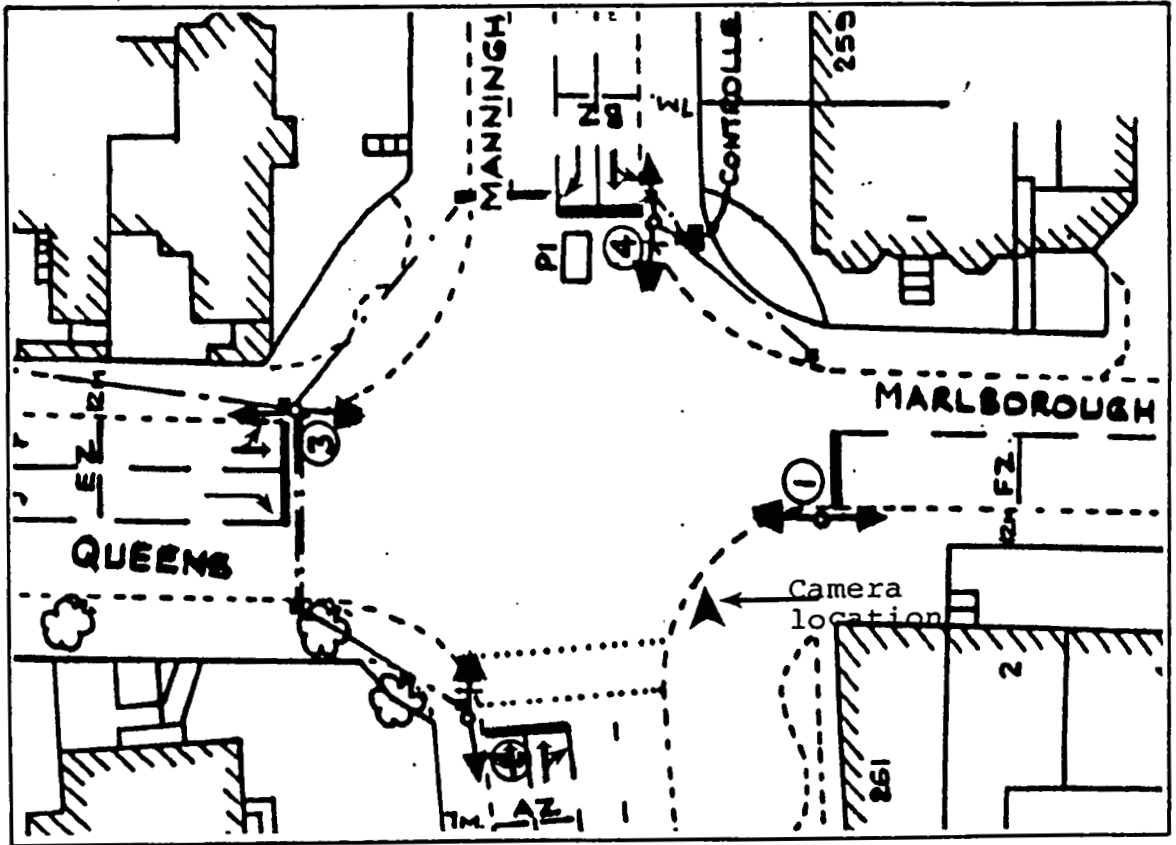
Site "2" junction layouts, camera location and traffic movements (Bradford).
